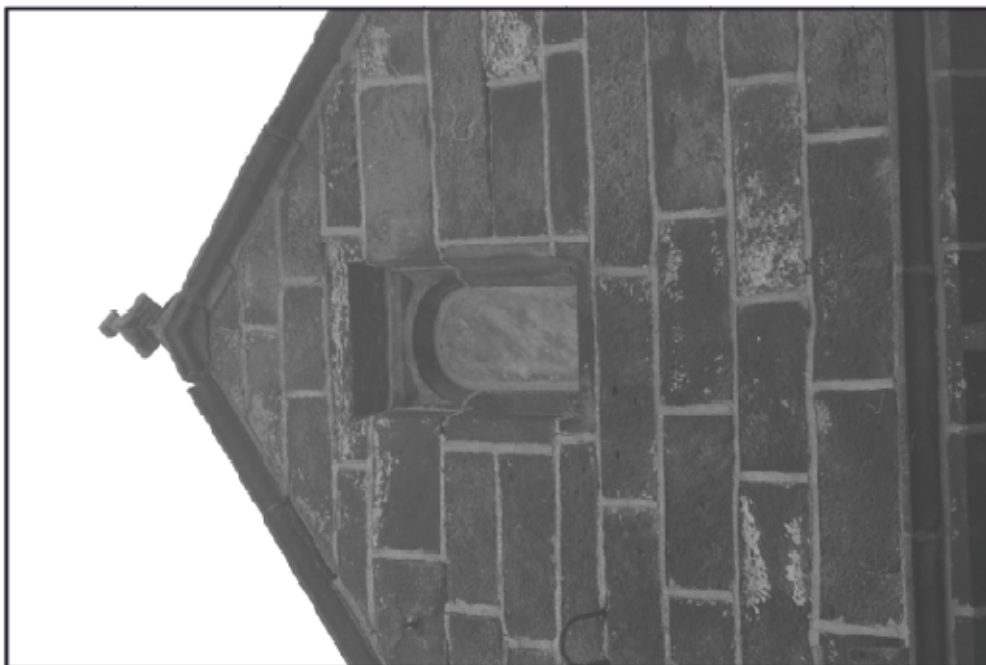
Detail of blind niche in gable of south elevation of west wing (film 1.27)
